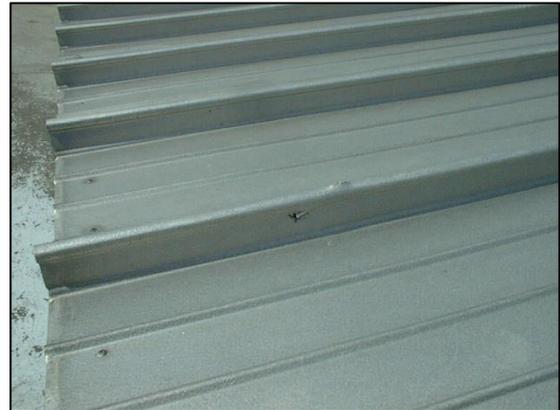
Over-turning of halter due to failure of fastener
